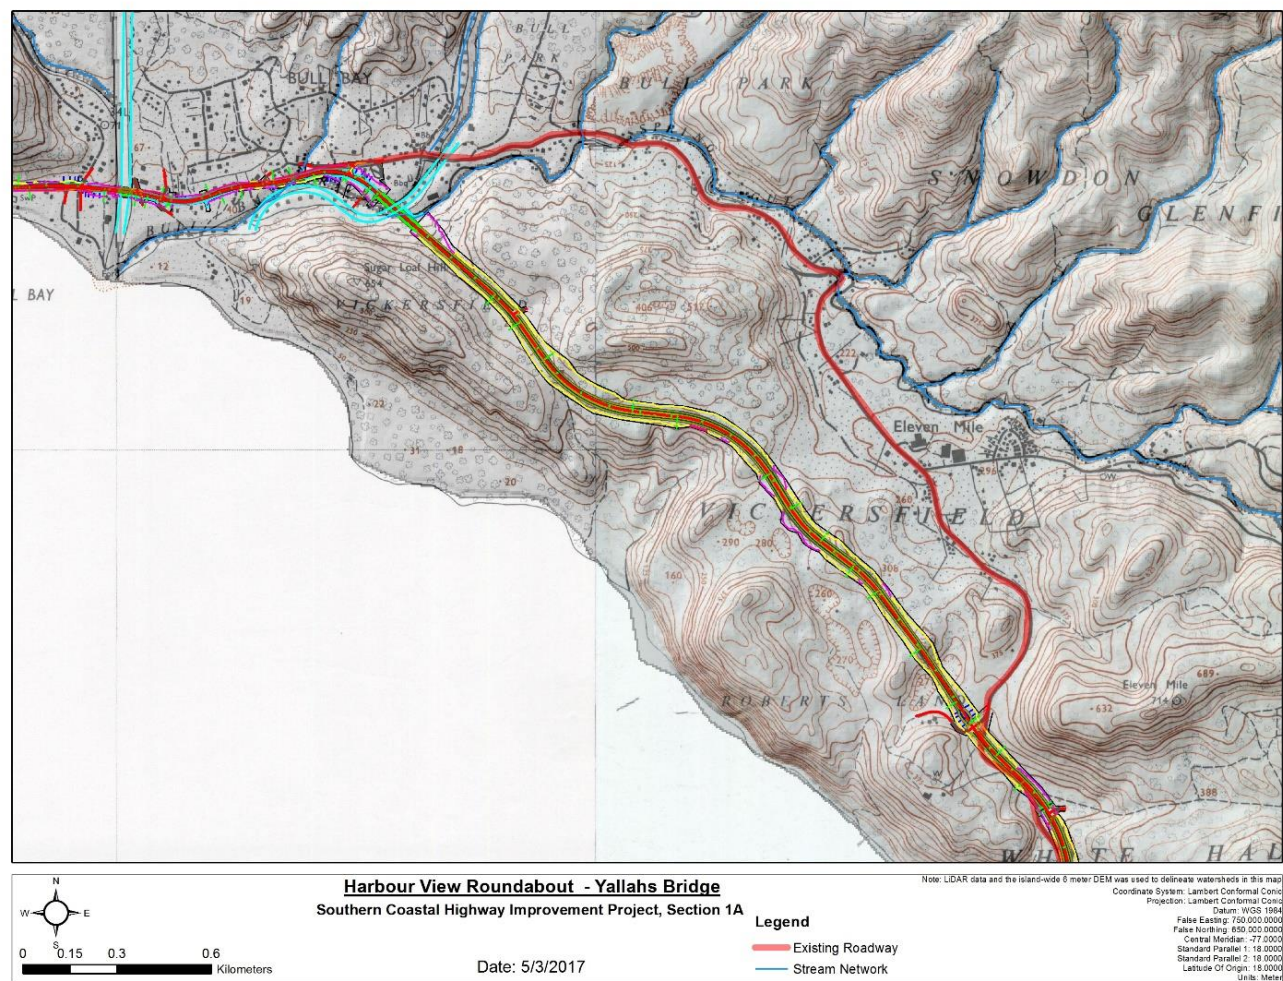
Roadway plan of new alignment superimposed on 3D image
